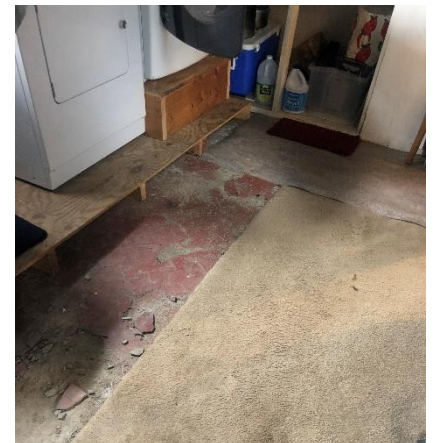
Photograph by Claire Buchinger. *Concrete Spalling*. April 2, 2023. Ithaca, New York.
